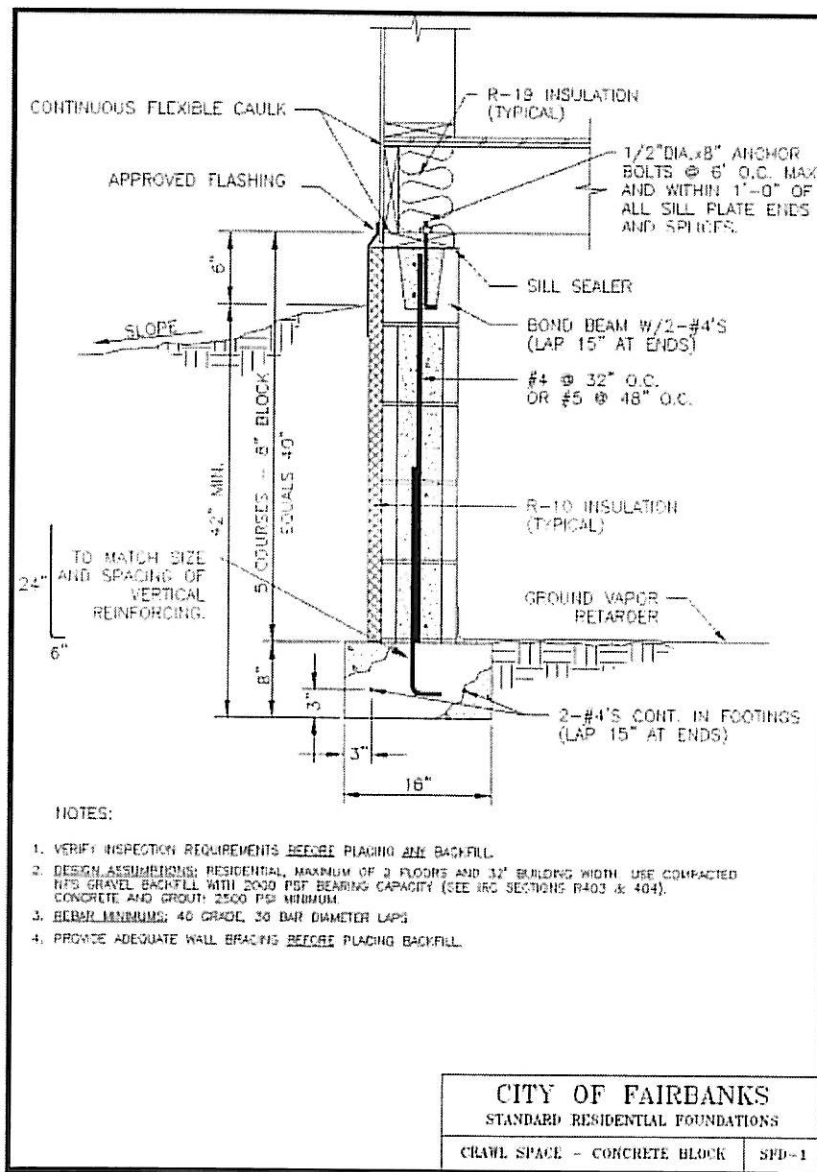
Sample of A Fairbanks Standard Foundation Detail
